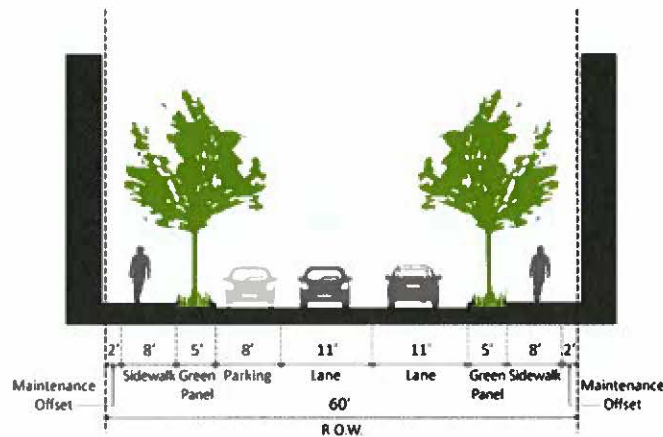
Business Street Section in 2019 Veirs Mill Corridor Plan
